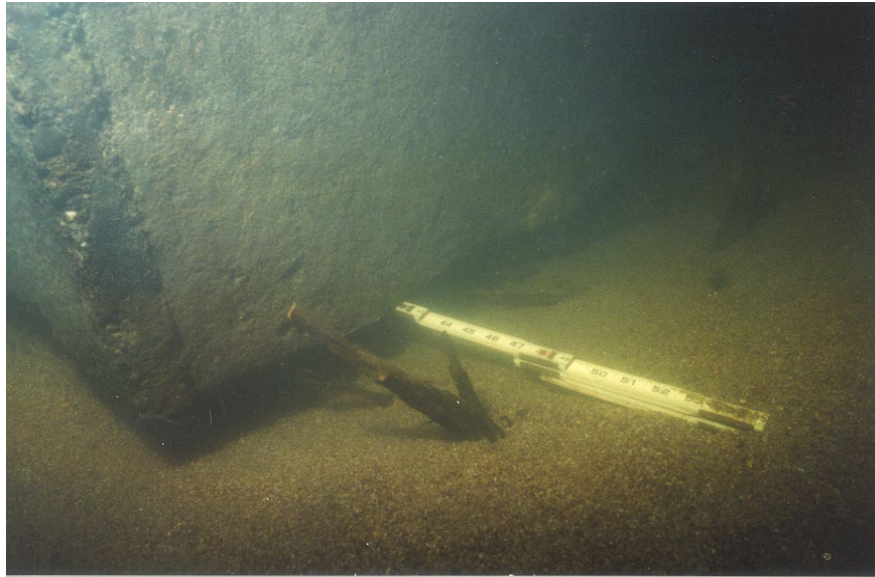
Local Scour - Causing Undermining of a Pier Footing
